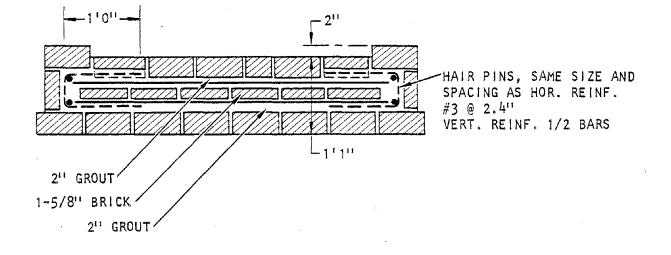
PIER SECTION SHOWING TYPICAL DETAIL AT JAMBS FOR 13" BRICK WALLS
